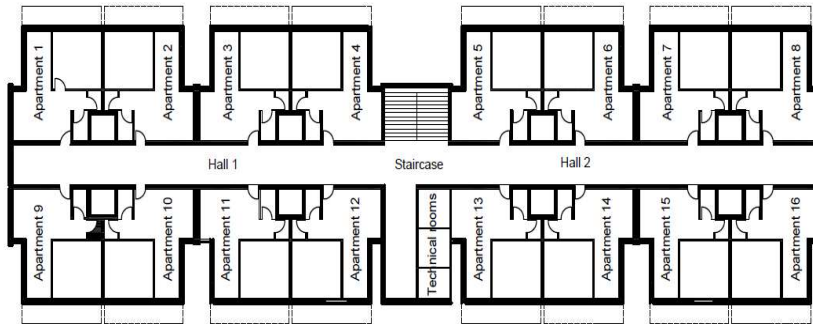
Floor layout of a typical storey in the base multifamily building in India
